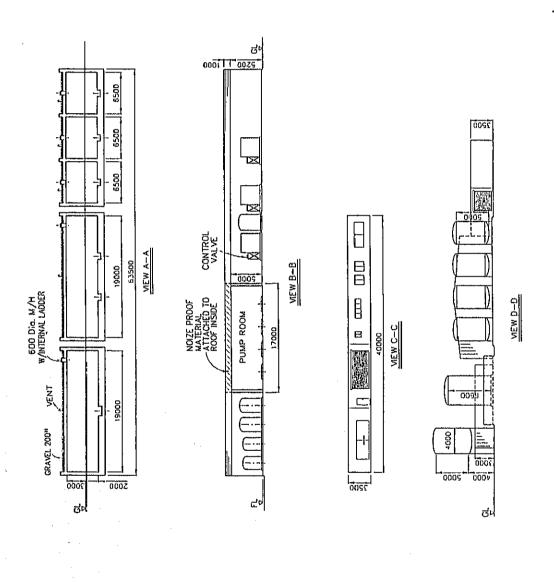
Views and Sections of the RO Desalination Plant
